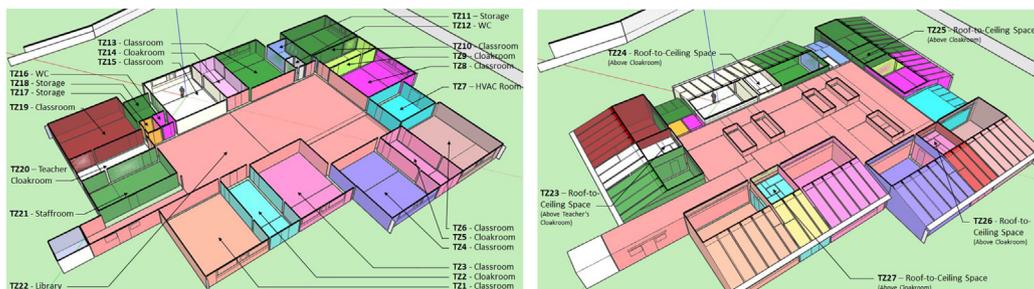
GEDVED Test Site. On the left, Thermal Zone’s Ground Floor Plan. On the right, Thermal Zone’s Ceiling Floor Plan.
